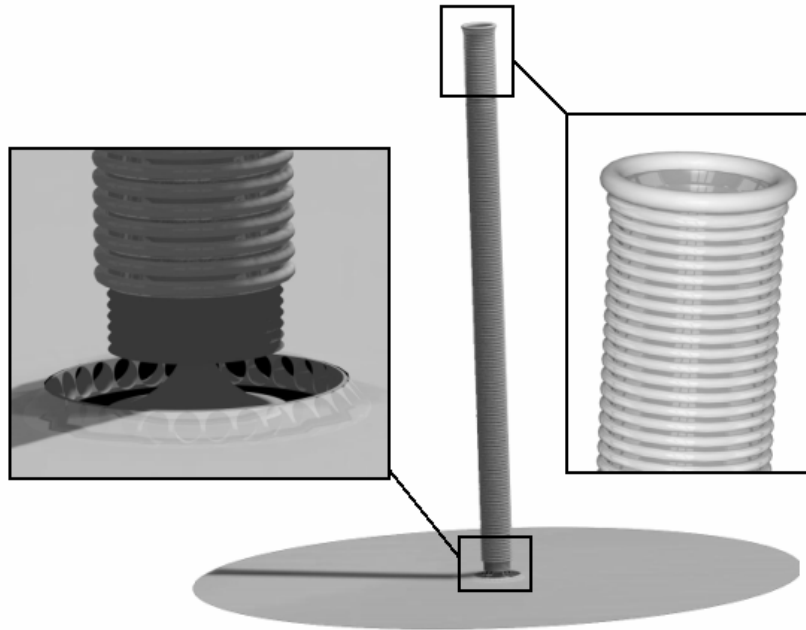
Layout of the STPS with base joint/turbines and chimney detail
